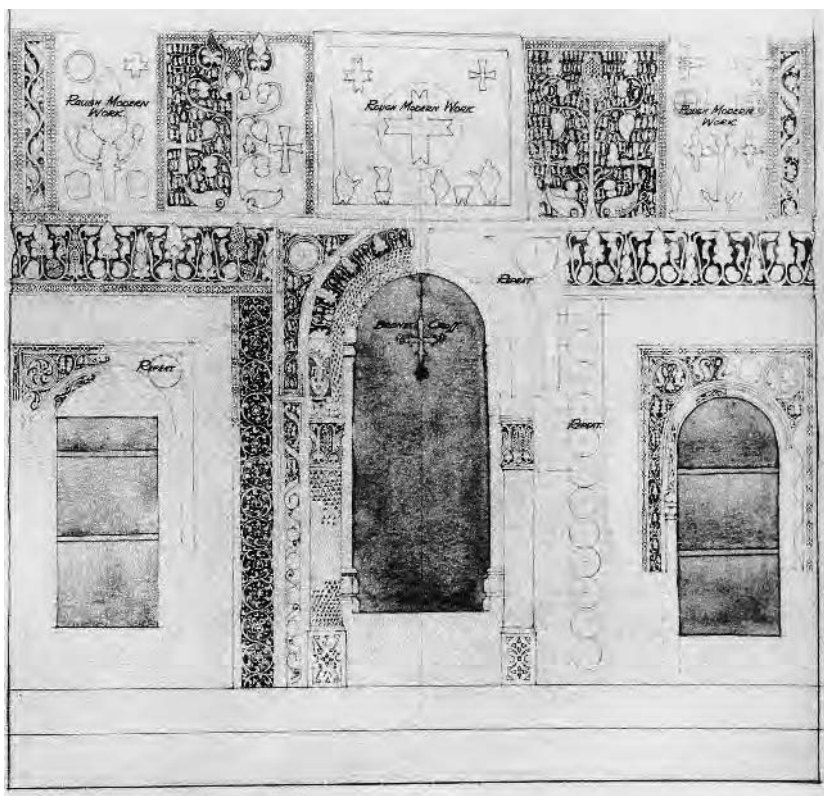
Church of al-Adhrā', Dayr al-Sūryān: drawing of East wall.
